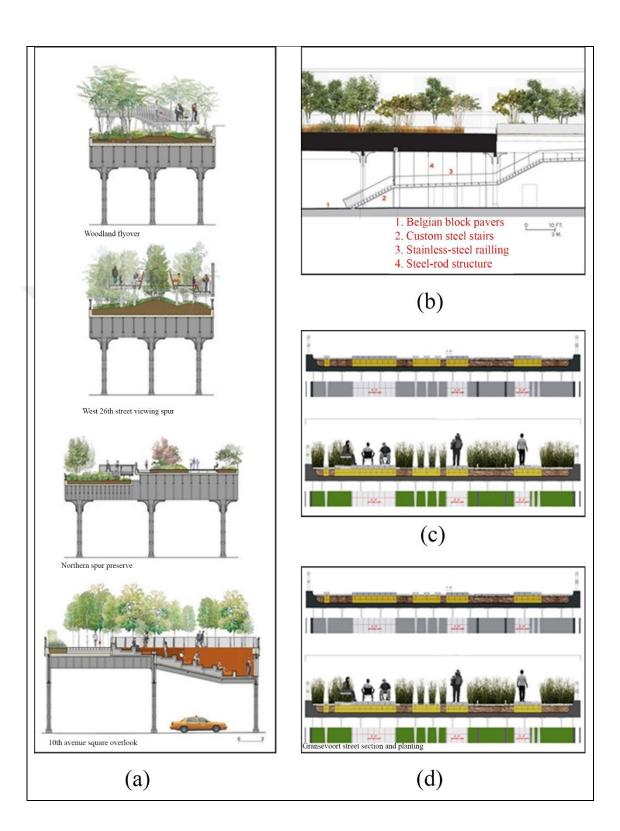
(a), (b), (c) sections of the high line; (d) the Gansevoort street section and plantings [70]
